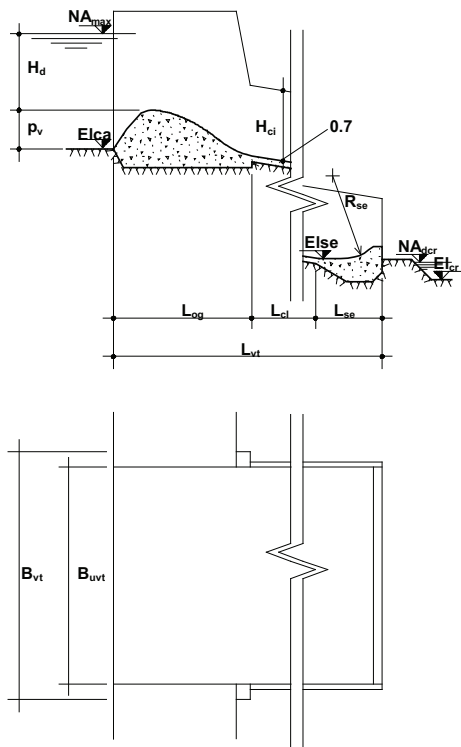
Typical cross-section of an ungated abutment spillway with a ski jump.
